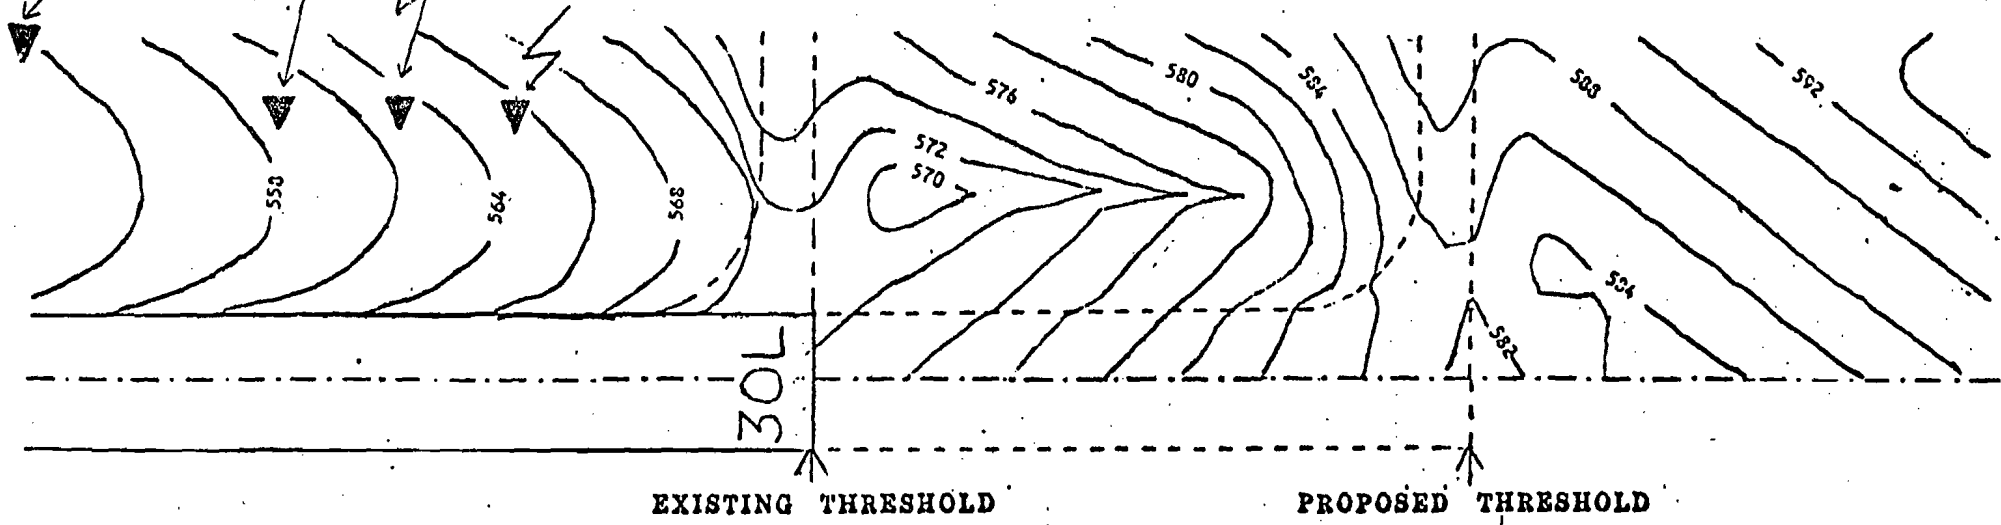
Extended Runway 30L, Proposed Sites and Grading.
